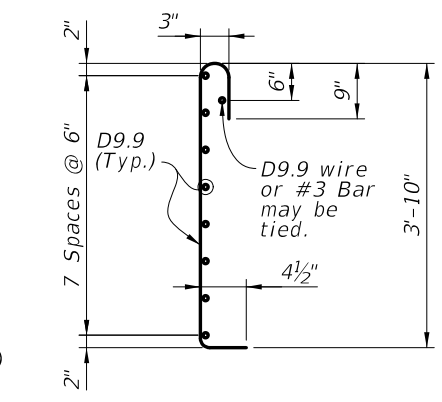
DETAIL "A" - SECTION AT INTERMEDIATE OPEN JOINT
